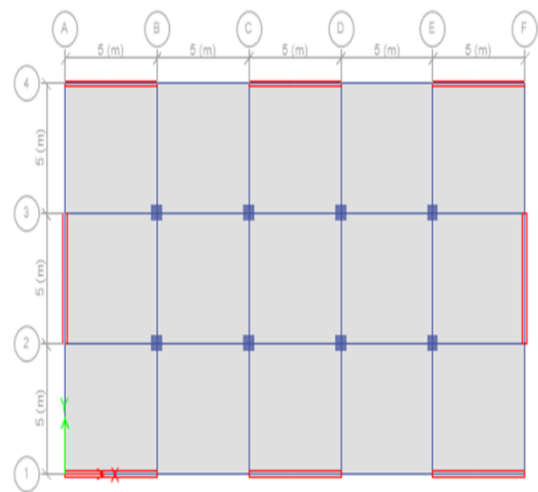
Plan of Solid and Coupled Shear Wall Structure
